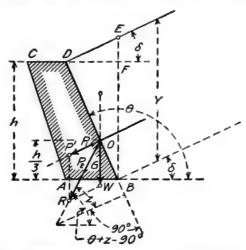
PRESSURE ON AN INCLINED RETAINING WALL.
